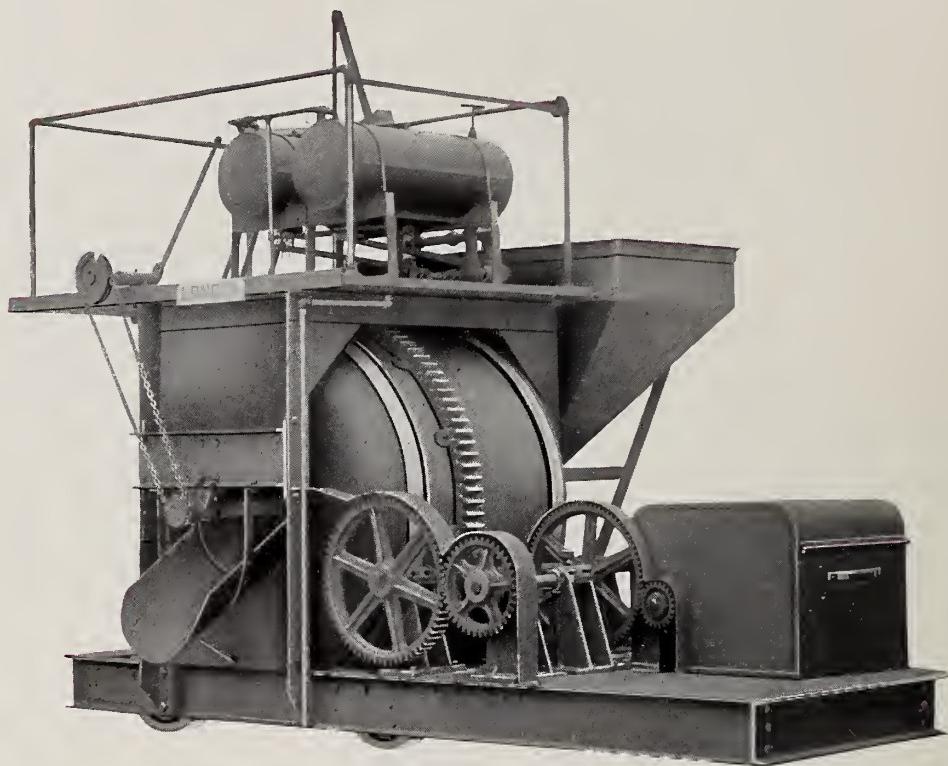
No. 30-S London Concrete Mixer with Stationary Hopper and operator's platform; equipped with electric motor, housed
